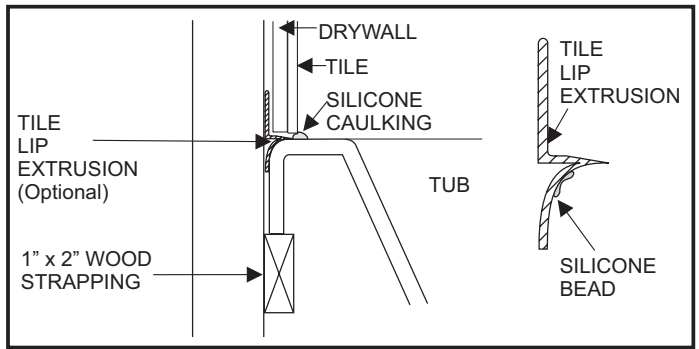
DROP-IN TUB IN ALCOVE INSTALLATION. WOOD STRAPPING, TILE LIP EXTRUSION AND WALL COVERING
